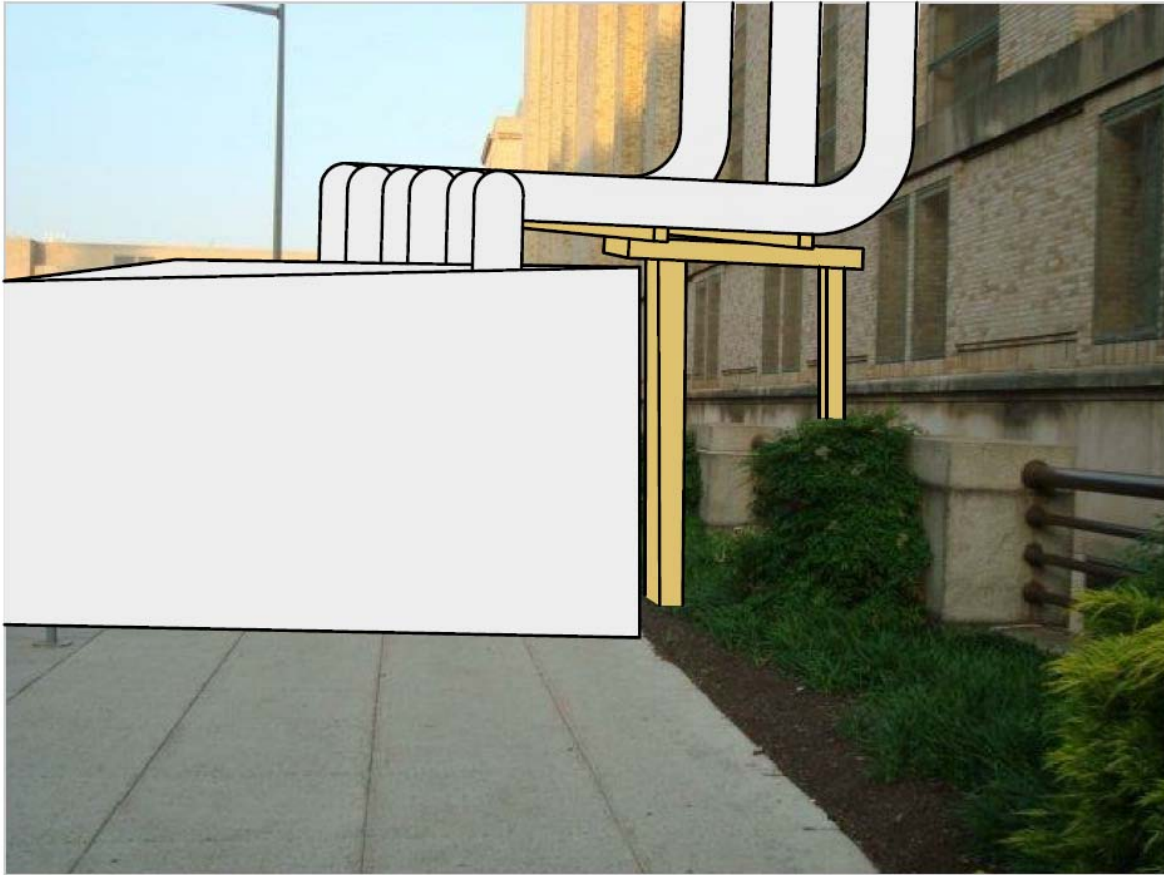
North Elevation Zoomed Out Photo Showing Proposed Boiler Location
